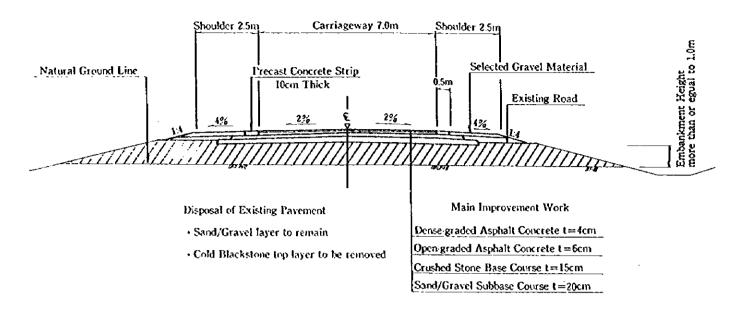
Cross-Section of Road for Type-III-1 Improvement
